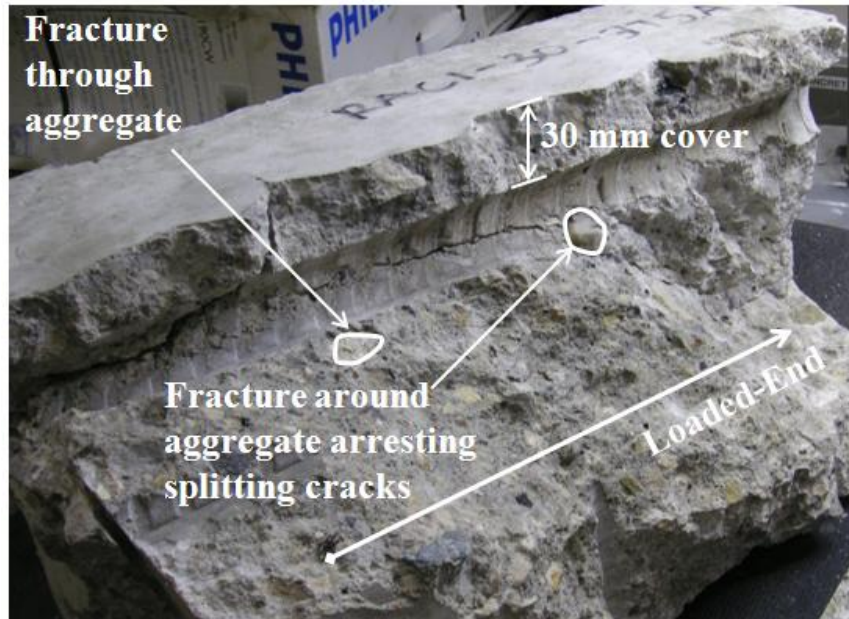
Main failure planes through concrete cover (dissected BE-RAC1-30-375A)
